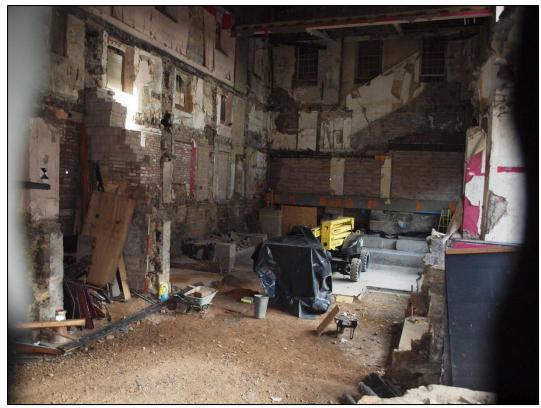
General shot of interior showing wall stubs (former party walls) extending from basement to first floor level
